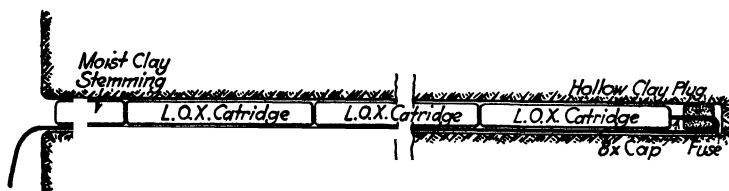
METHOD OF INSERTING DETONATING CAP IN DRILL HOLE.
